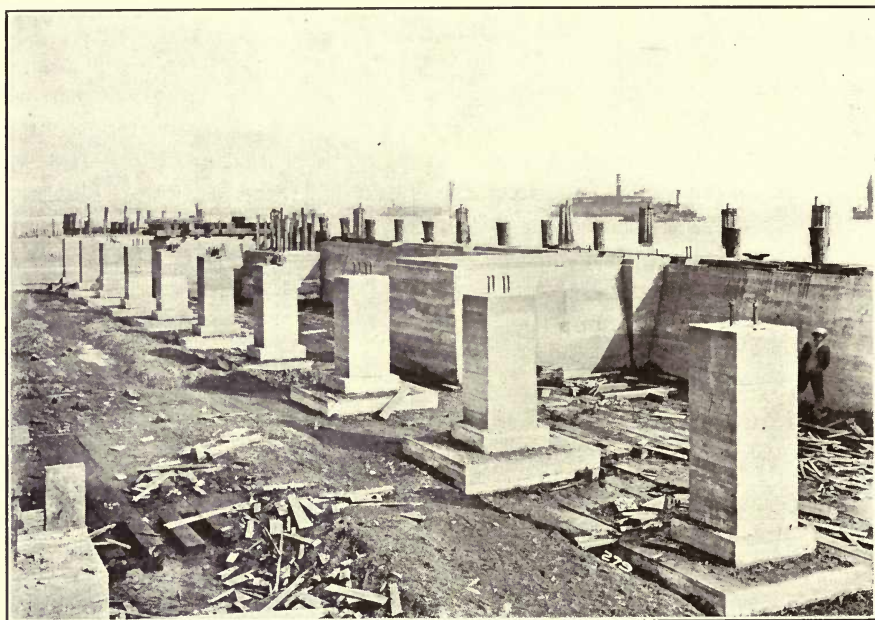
HOBOKEN PIER DURING CONSTRUCTION.
